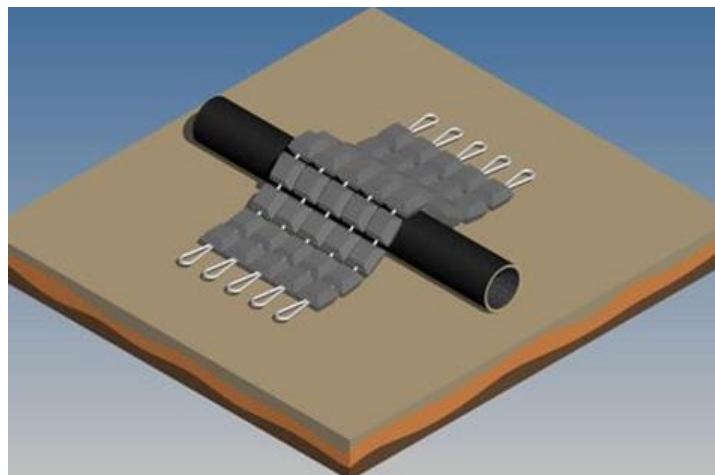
Concrete mattress for span rectifications or flowline protection or stabilisation
